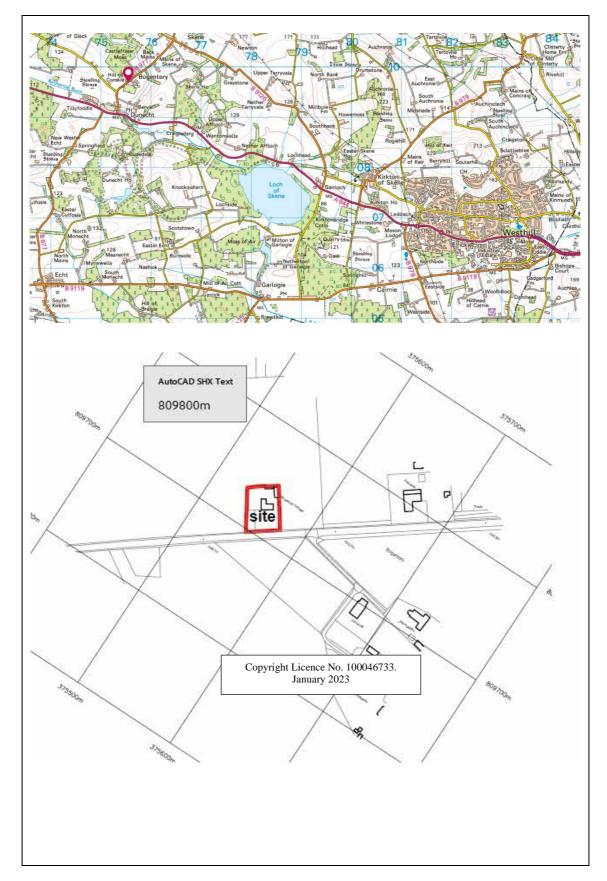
PROPOSED SITE LAYOUT & TEST LOCATION PLAN
